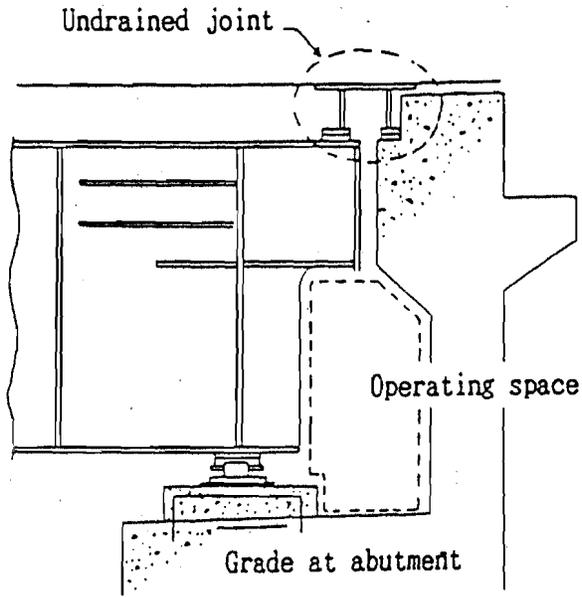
Undrained joint between approach and bridge deck and grade at abutment should be provided.
